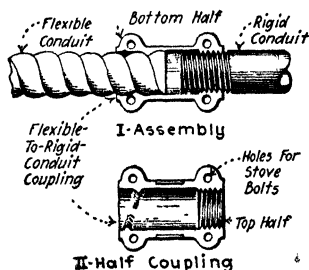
Joining flexible conduit to rigid conduit with special coupling.
